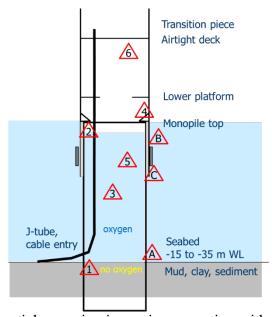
An overview of potential corrosion issues in connection with the monopile-based foundation.
